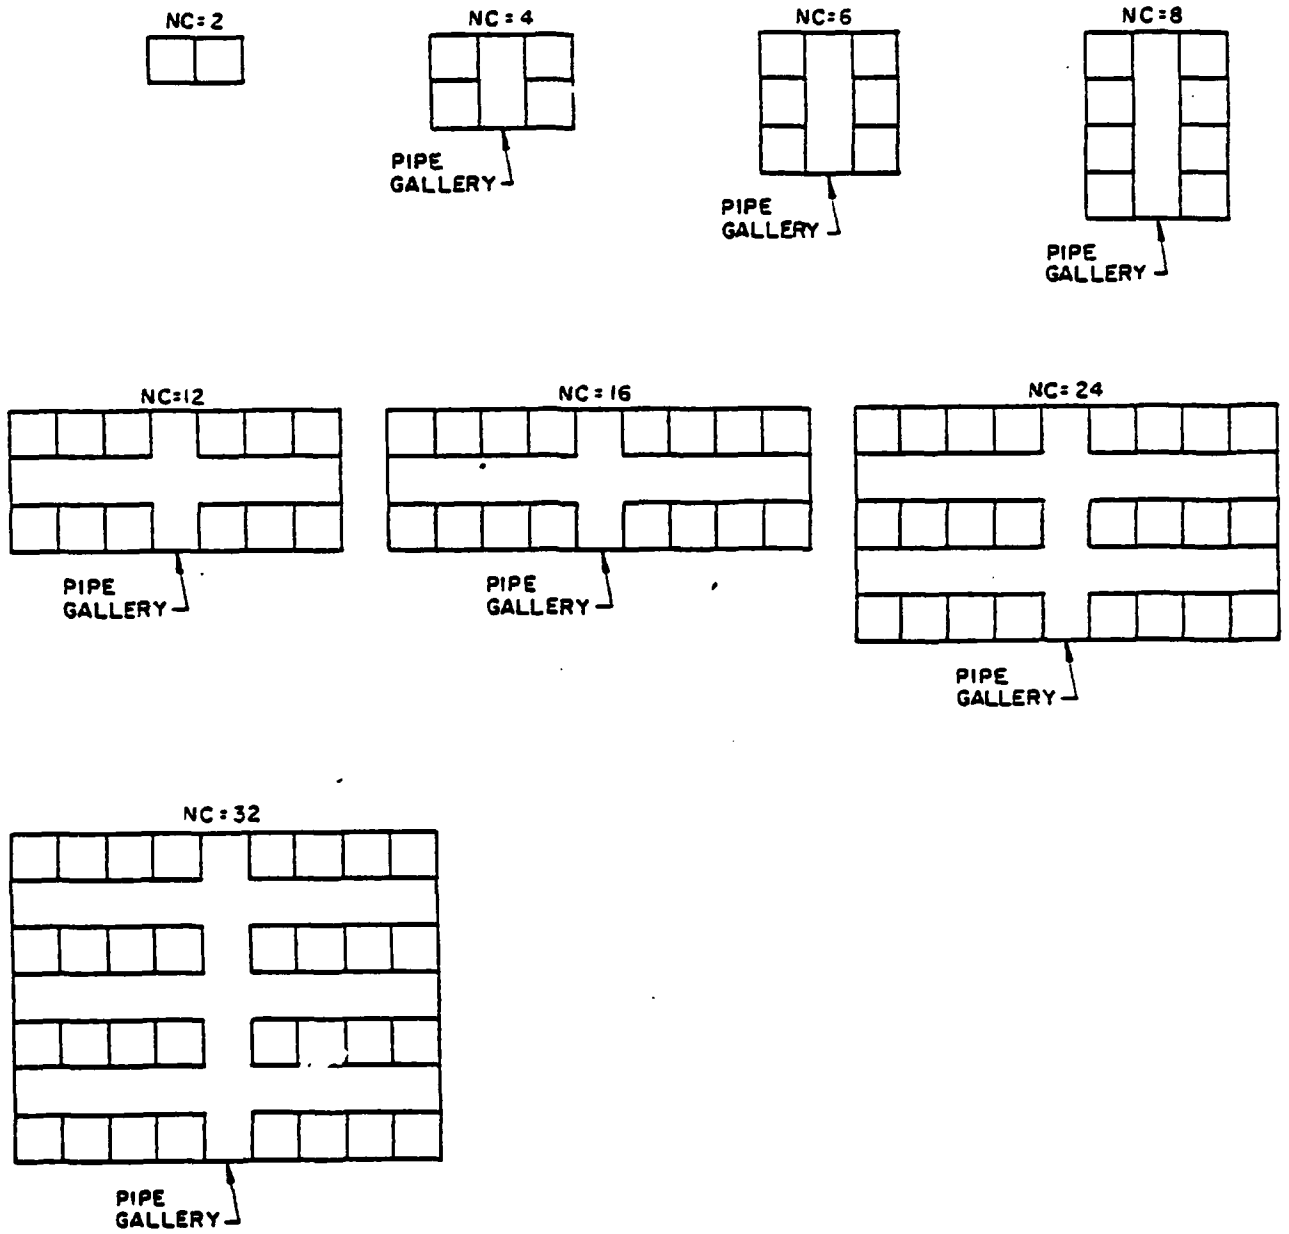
EXAMPLES OF COLUMN ARRANGEMENTS
